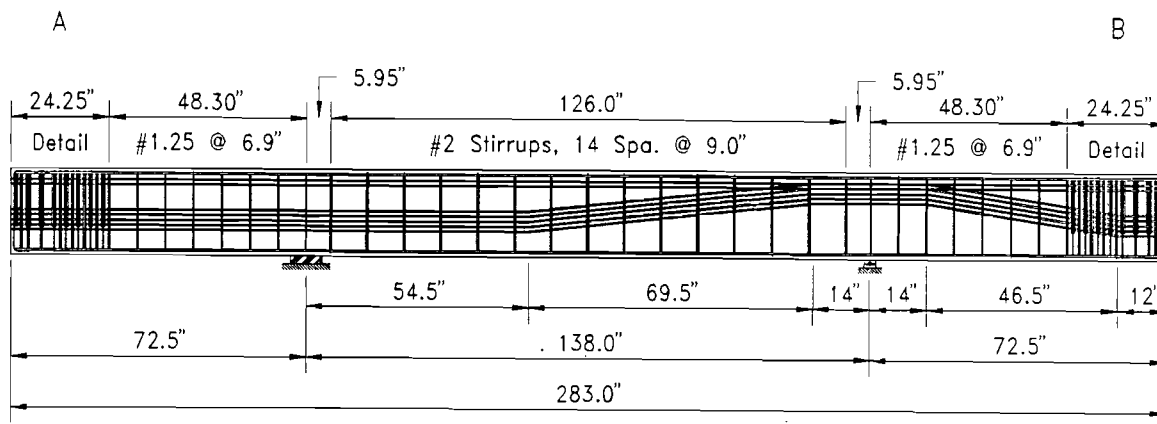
Beam 1A dimensions, stirrup locations, and tendon drape points.
